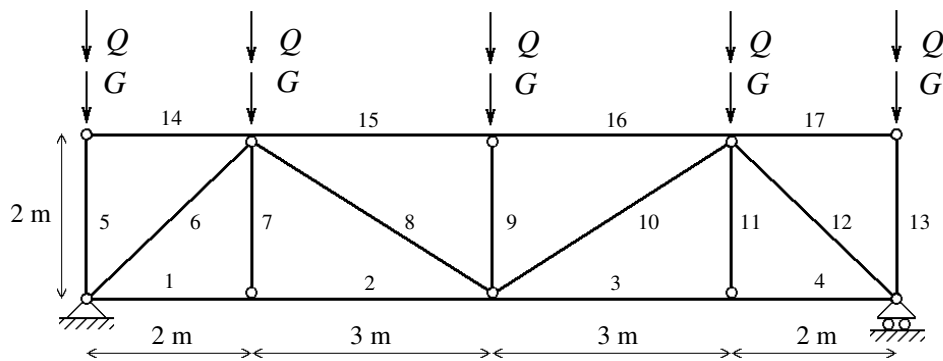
Structural model of a planar timber truss with elements' numeration and applied loading.
